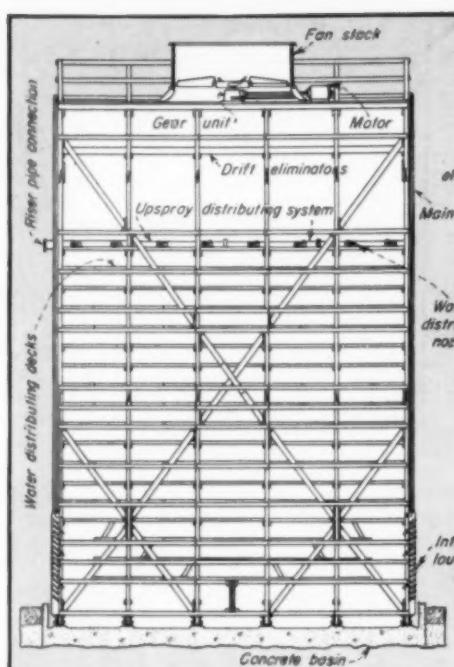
Cross section of typical mechanical draft cooling tower with up-spray nozzles and drift eliminators above the spray chamber
